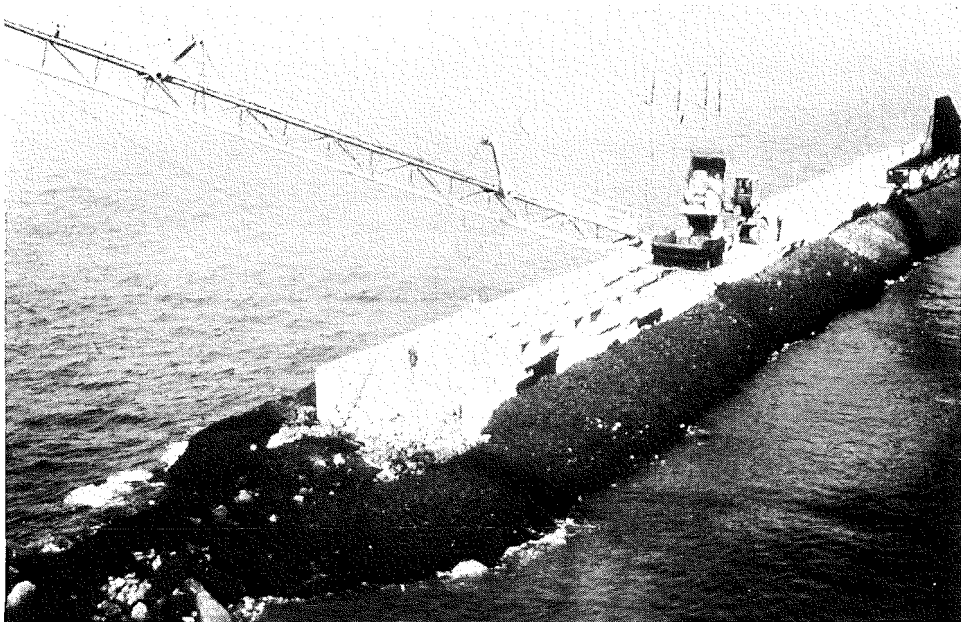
Construction of the IJmuiden breakwaters using dense stone asphalt
